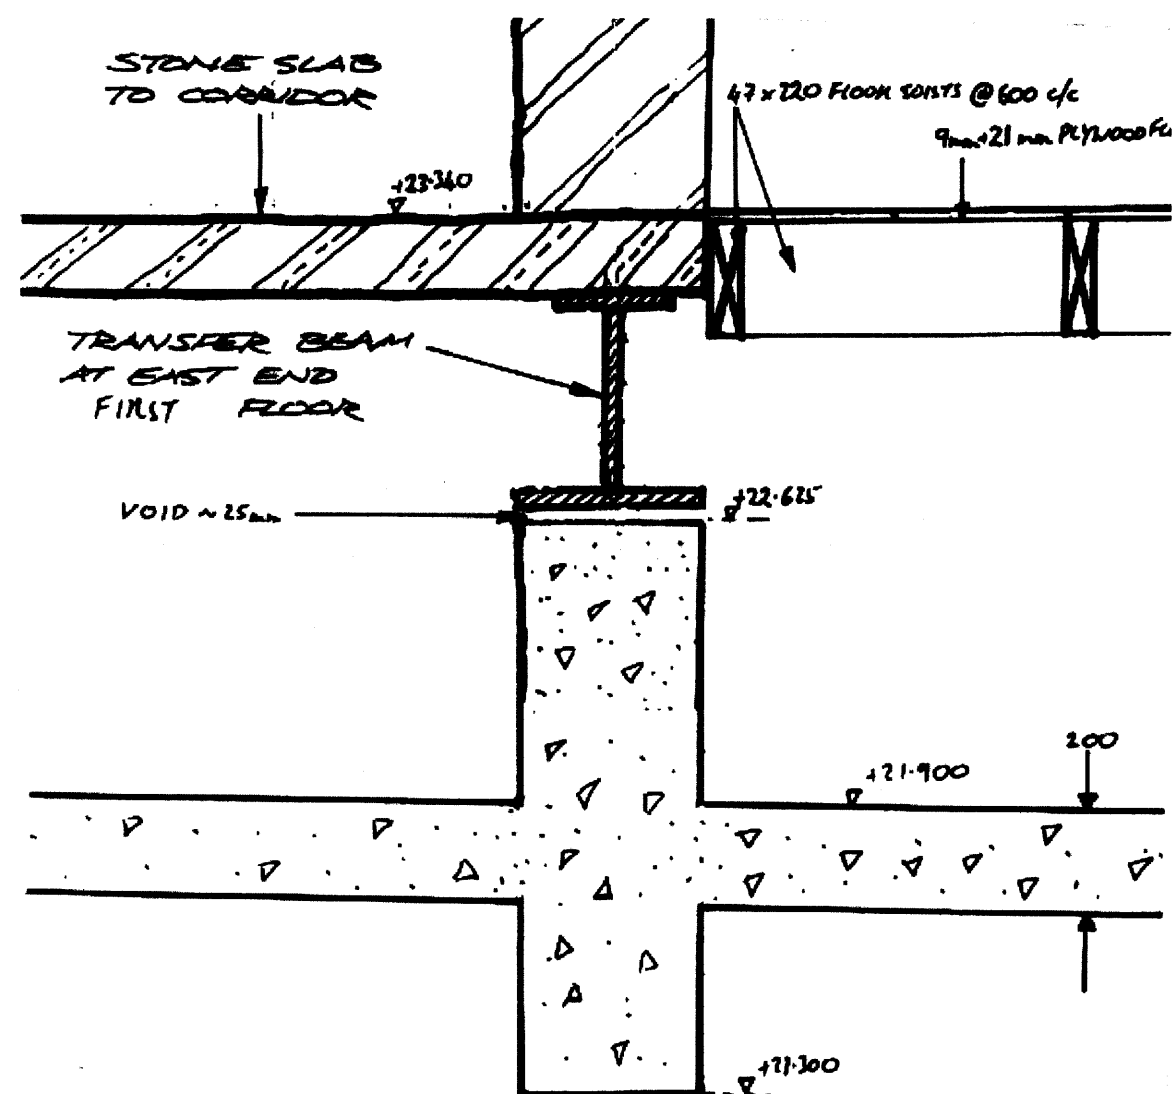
Room/corridor interface 1st floor east end, transfer beam above concrete beam. (SK085)
